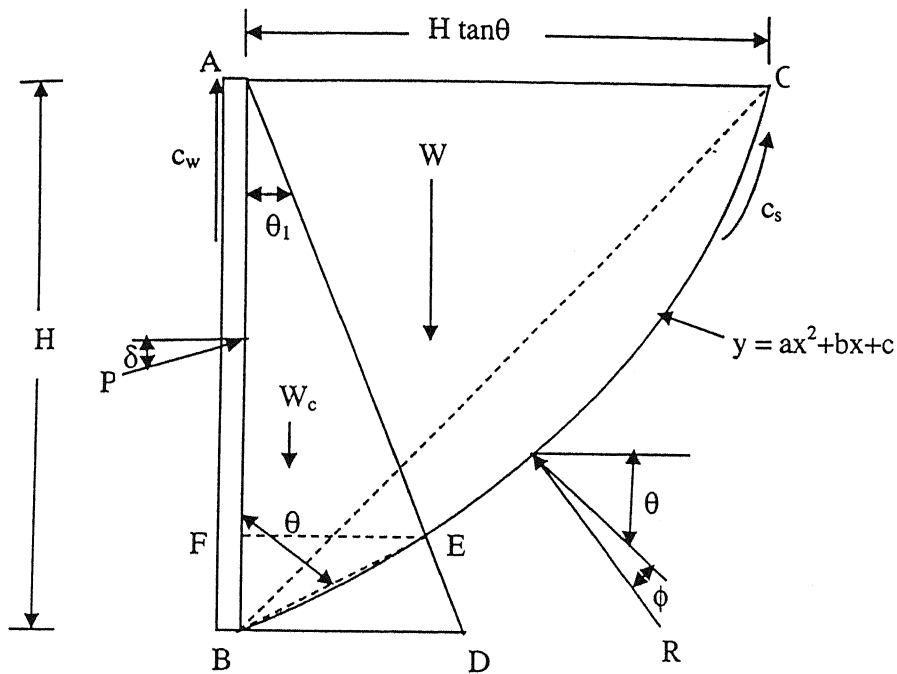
Forces acting on counterfort retaining wall (without loading, unreinforced backfill)
